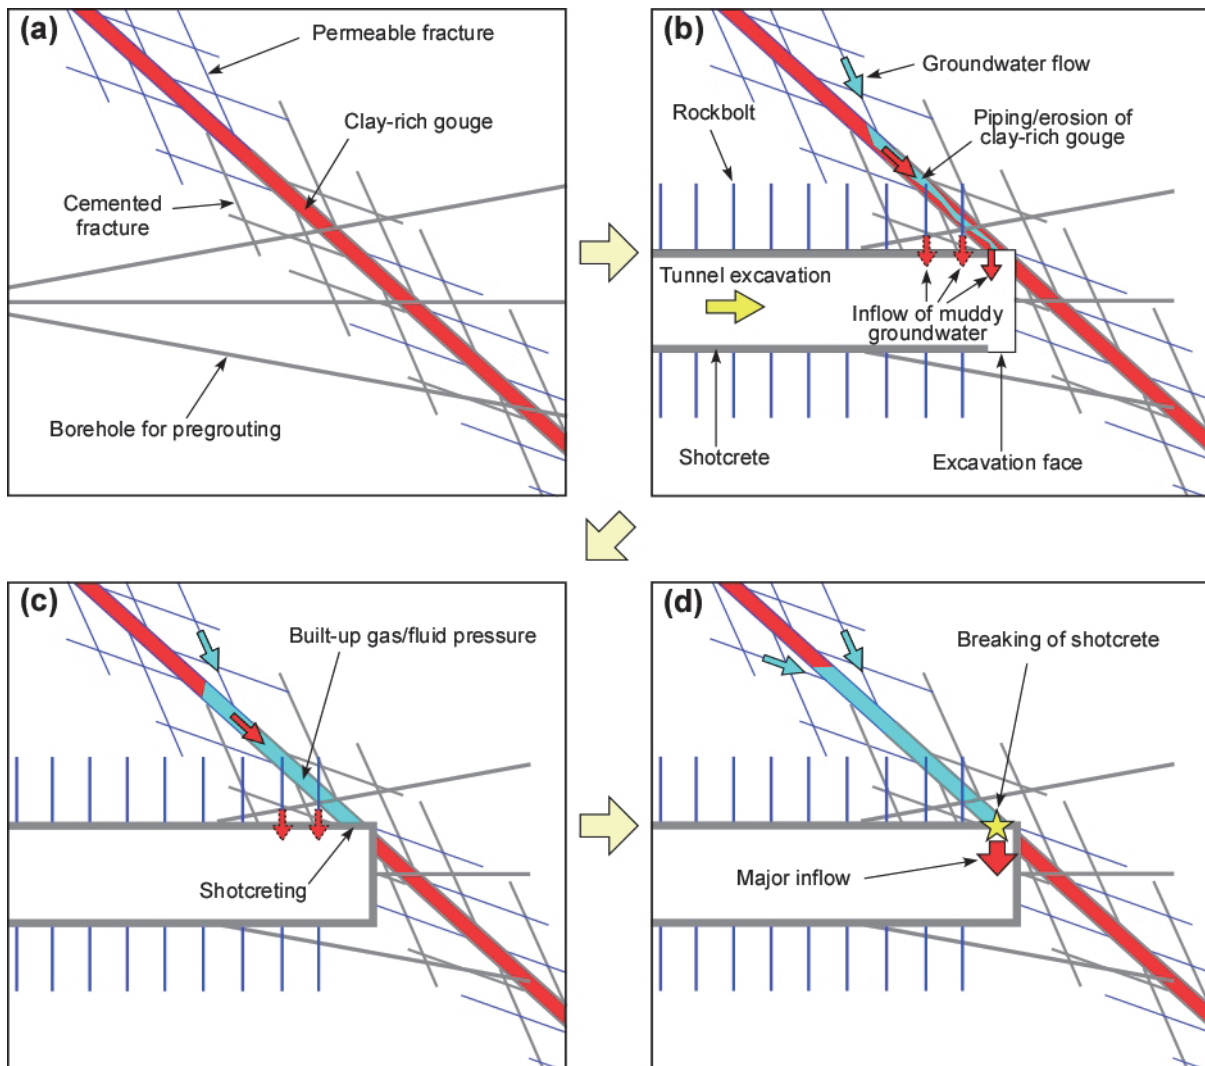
Sketches showing the processes assumed to have caused the major inflow during tunnel excavation (horizontal sections). (a) The gouge-bounding fractures and damage zone fractures of the S1 Fault intersecting the boreholes were cemented by pre-grouting. (b) During excavation, the gouge was washed out into the tunnel through the rockbolts penetrating the gouge and along the boundary between the shotcrete and the gouge on the excavation sidewall. The resulting piping/erosion of the gouge induced groundwater flow from the outer aquifer of the pre-grouted zone. (c) After an excavation face exposing the S1 Fault was temporarily shotcreted, gas/fluid pressure in the S1 Fault zone built up. (d) A major inflow occurred, breaking the shotcrete.
